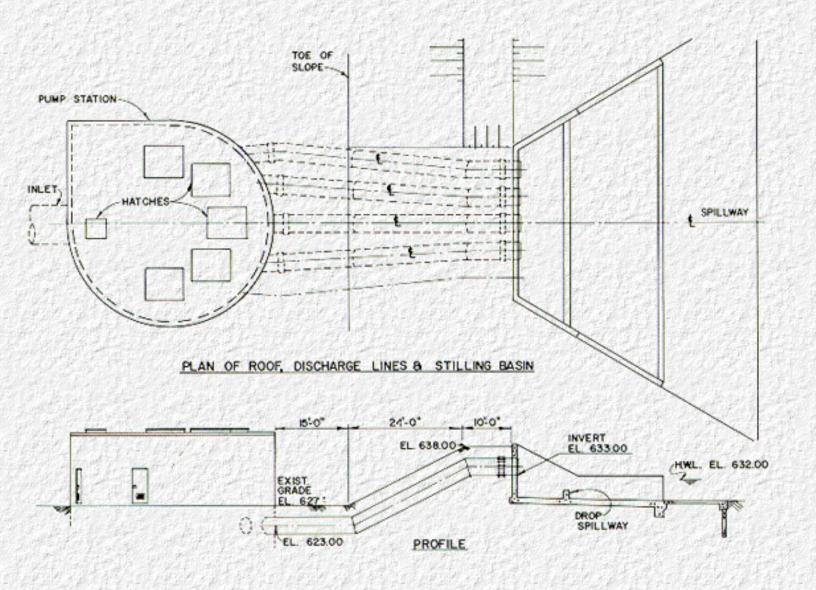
Wet-Pit Type Pump Station - General Layout
